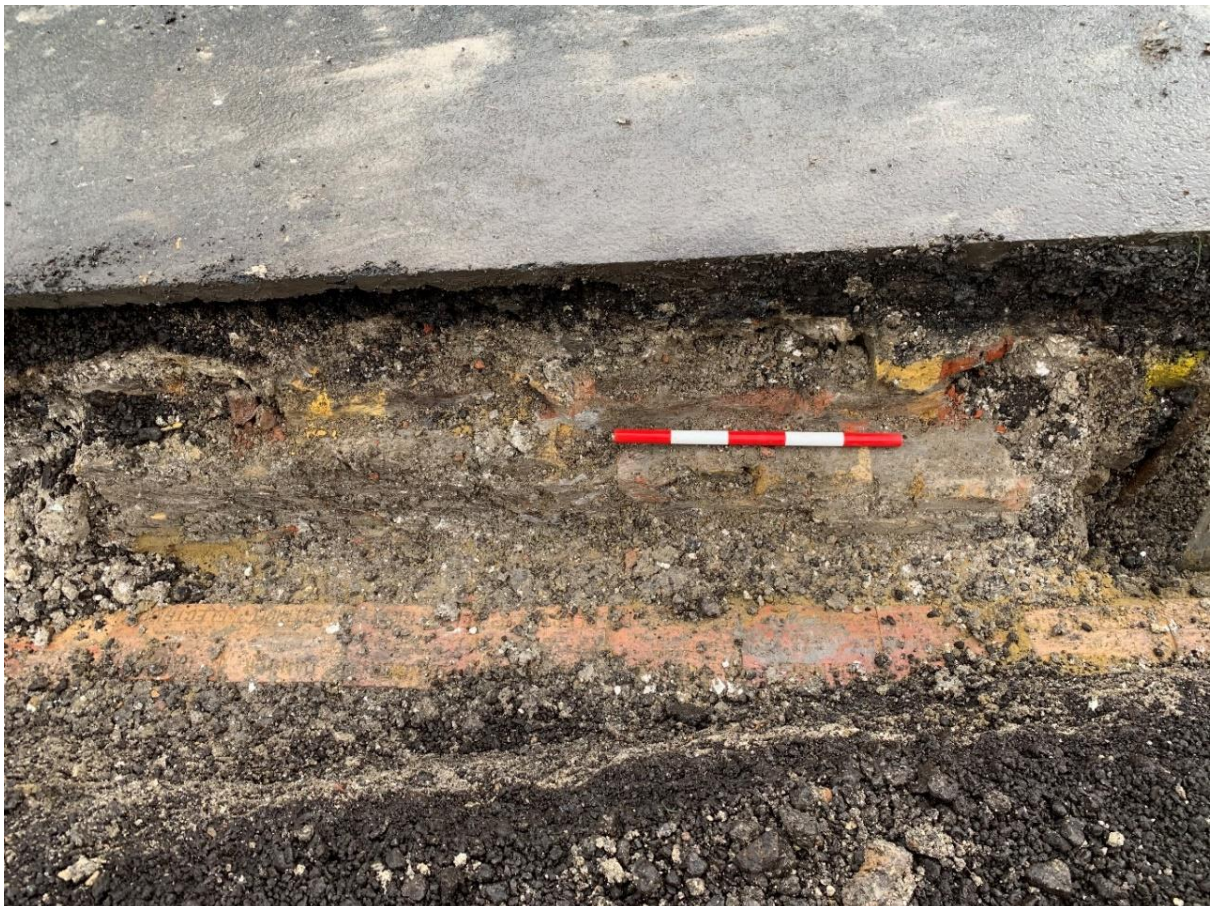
Detail of nineteenth century brick manhole, Context F. 9, exposed in east face of trench. Scale, 50cm
